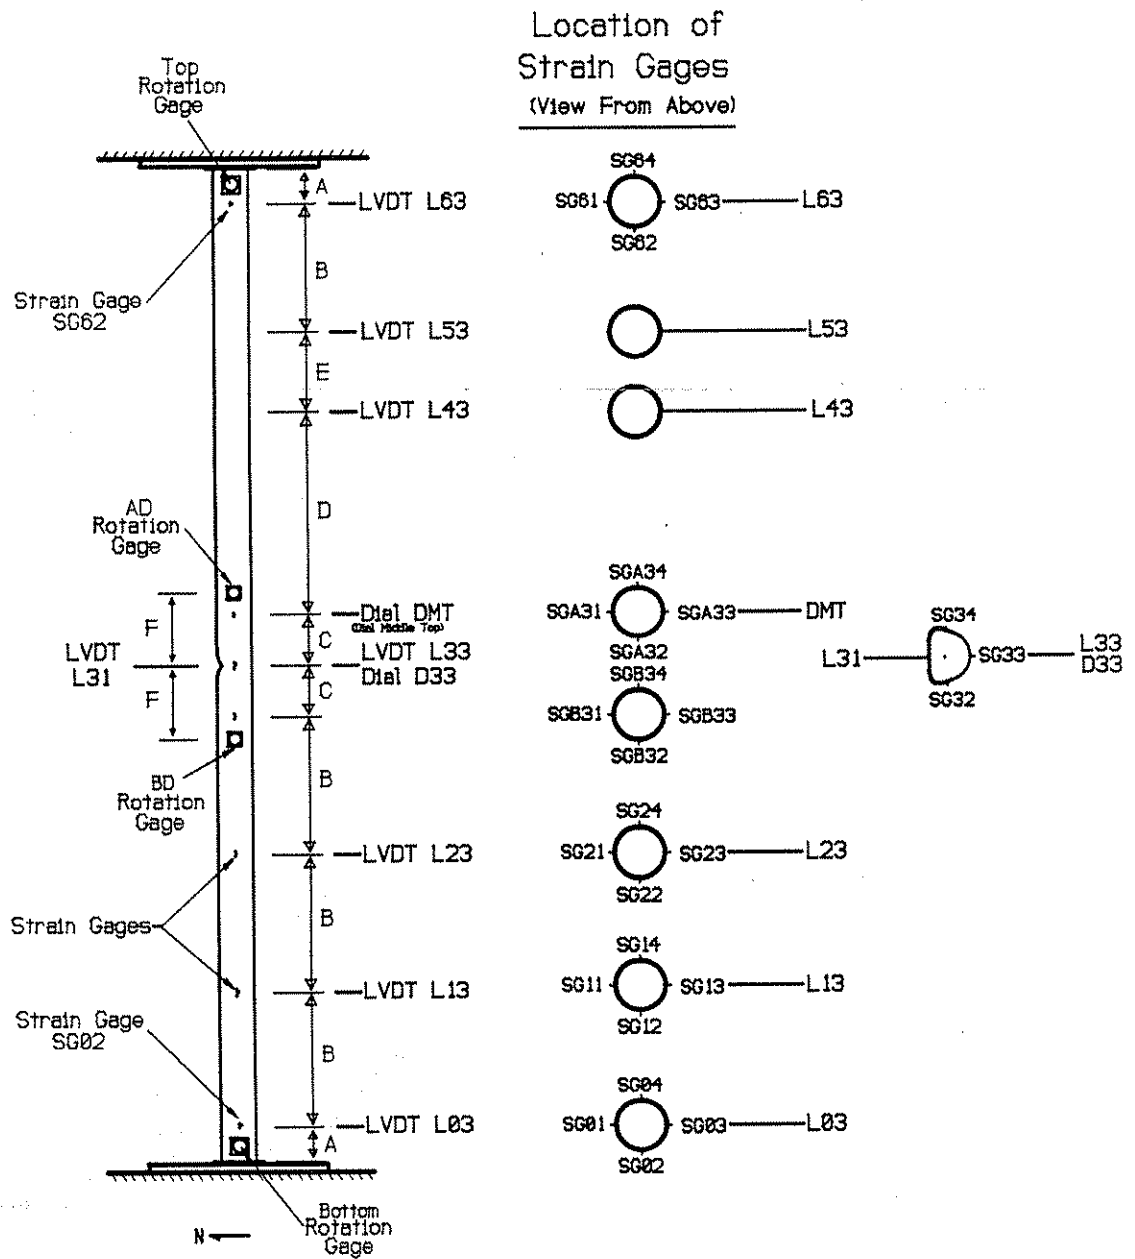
Fixed Ended Specimens P1F and P2F – Location of Gages
